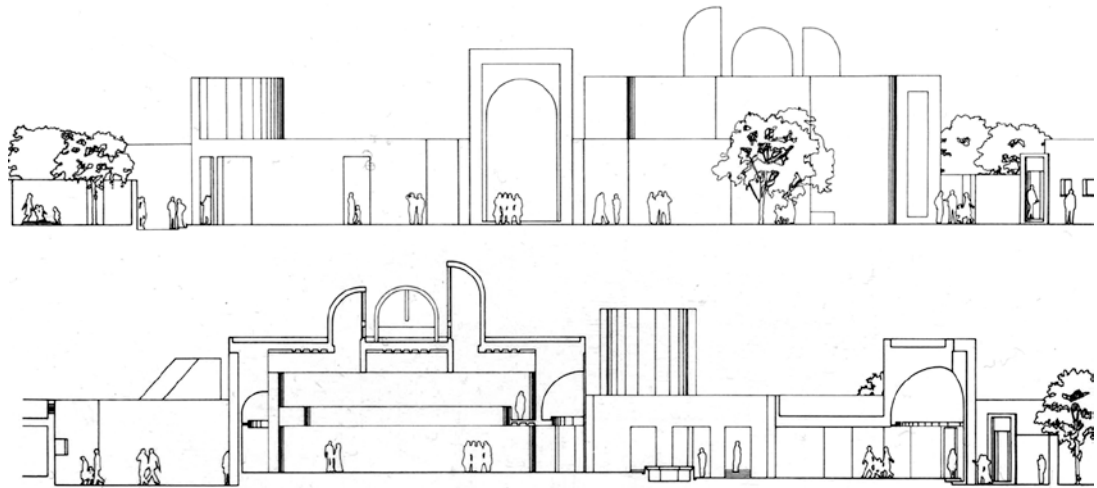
Section drawing and street elevations of Shushtar New Town with recognisable elements of traditional Iranian architecture such as framed entrance, wind tower and domed roof (source: Diba 1981)
